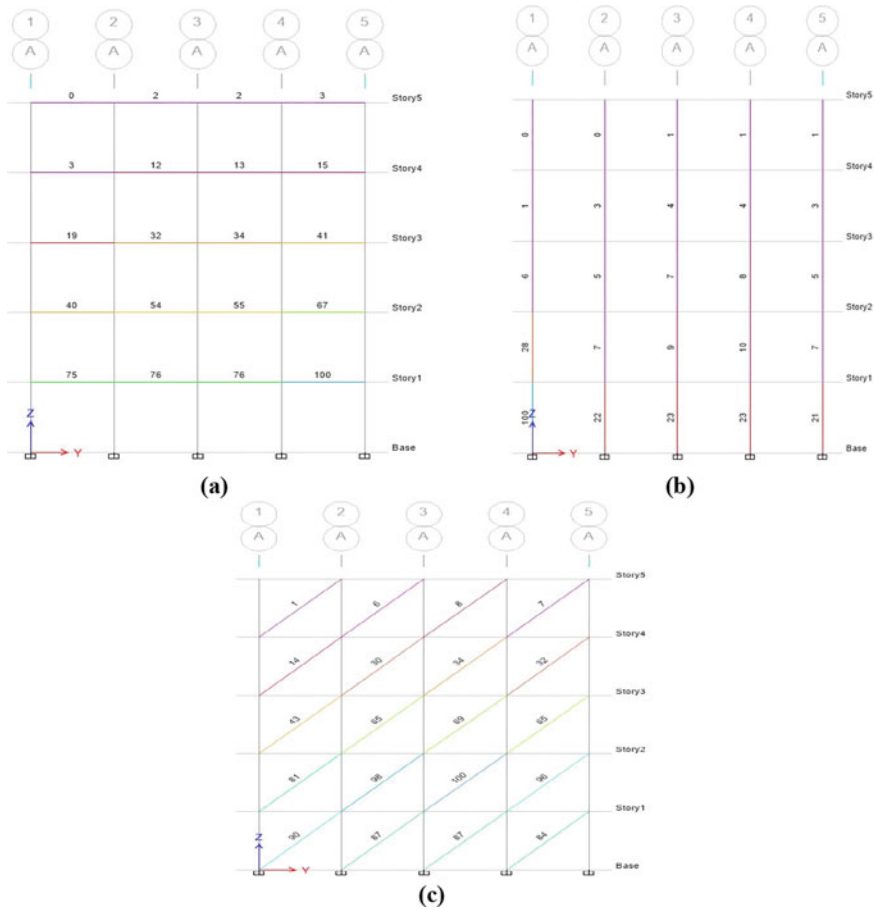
Normalized modal energies (NME) for infilled RC frame of a beams b columns c bracings/strut
